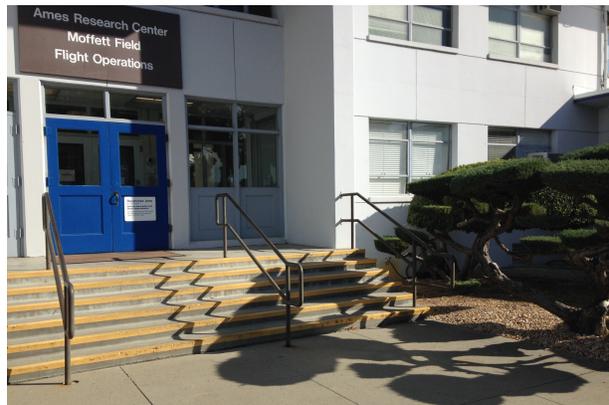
Primary entrance and stairs of Building 158. Top landing of the proposed accessibility ramp will be located at southern portion (center-right) of the stairs, looking southeast. Source: Page & Turnbull, 2017.
